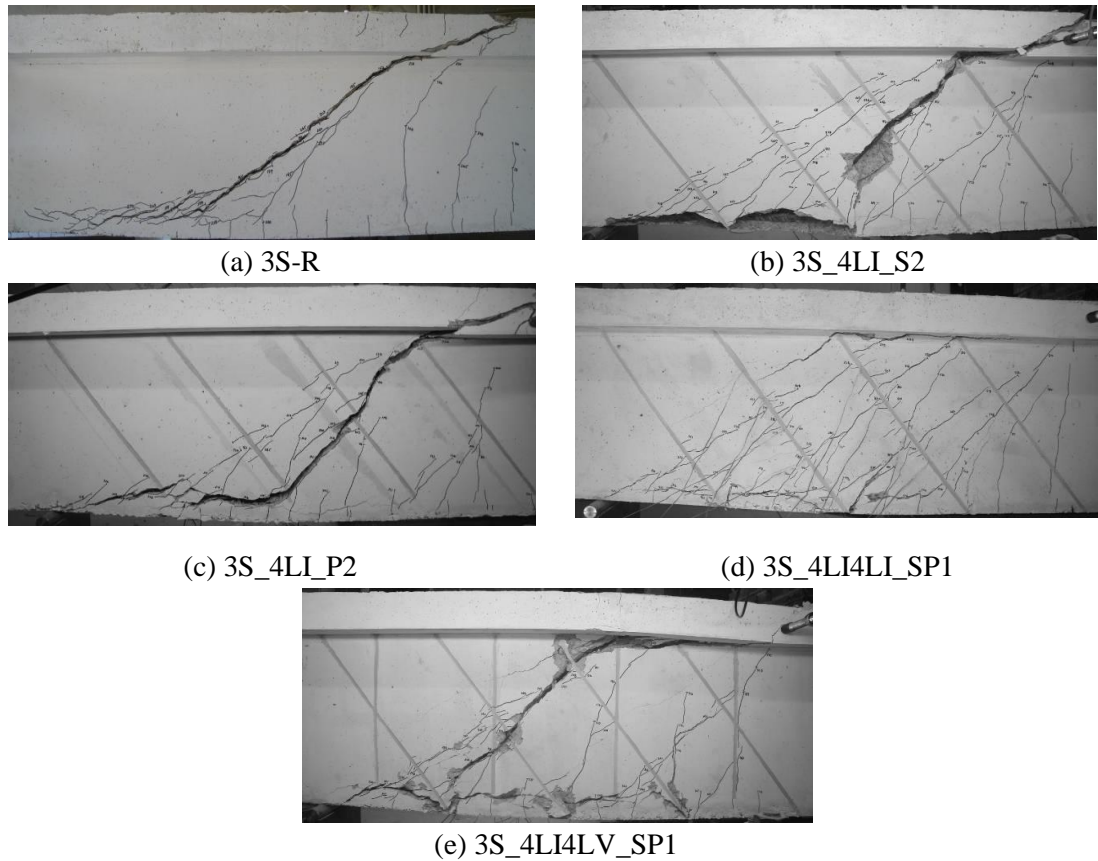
Crack patterns of the tested beams at failure (Barros and Dias, 2013).
